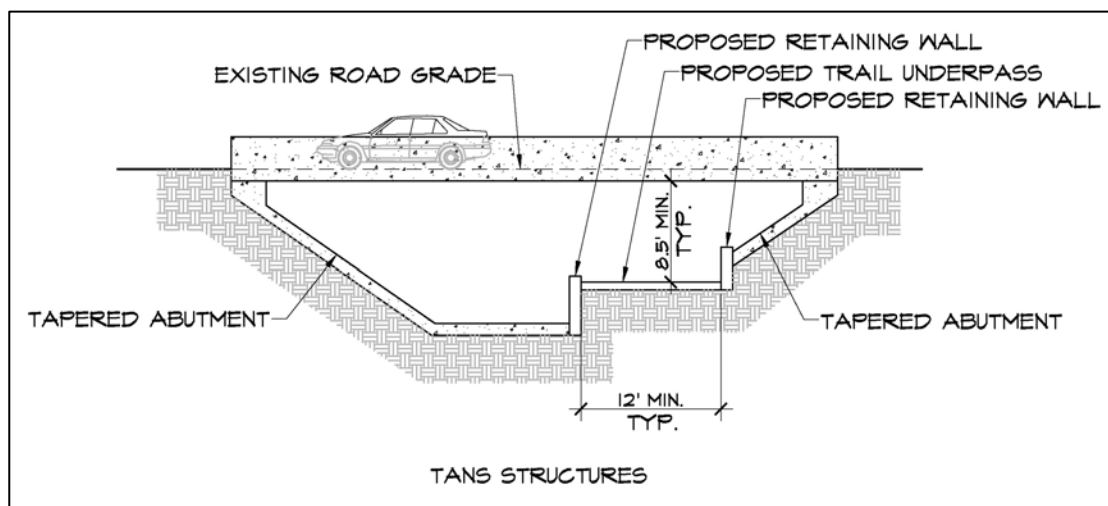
Typical trail underpass design to a tapered abutment bridge (TANS) structure similar to Kiely Boulevard.
